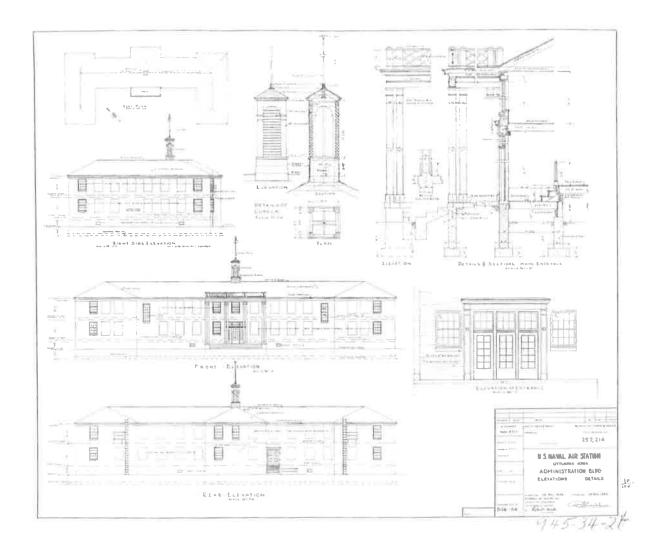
Elevation drawings and details (Russell B. Moore Co., May 15, 1943)
